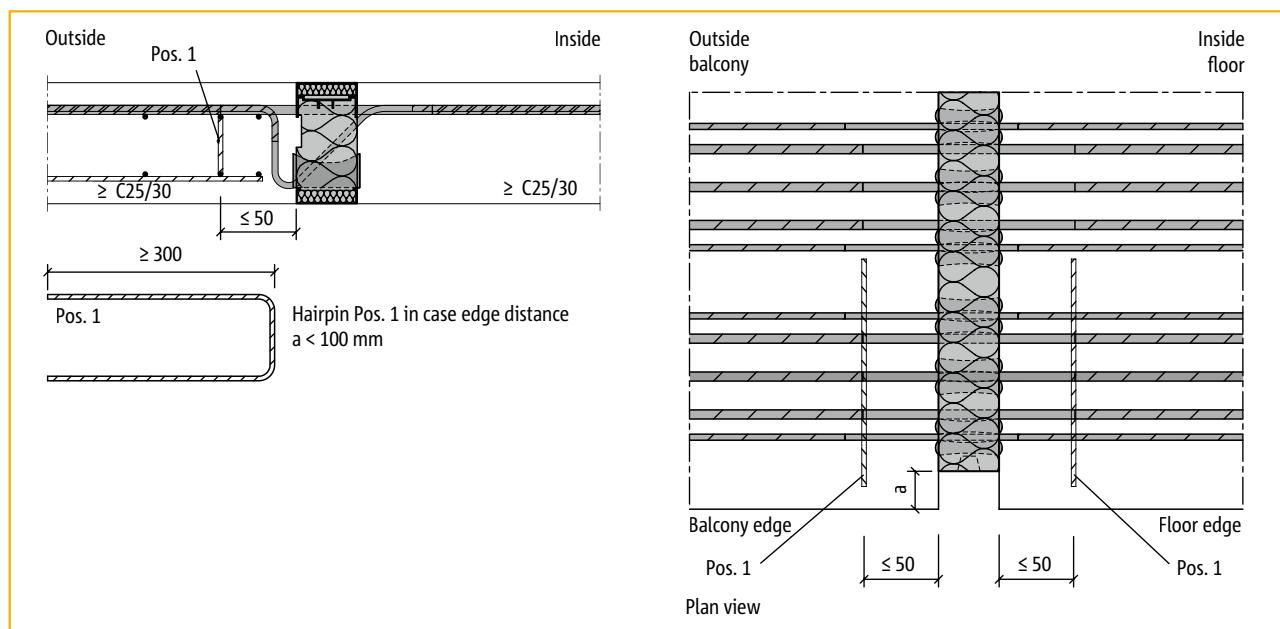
Schöck Isokorb® type K.. additional reinforcement Pos. 1
